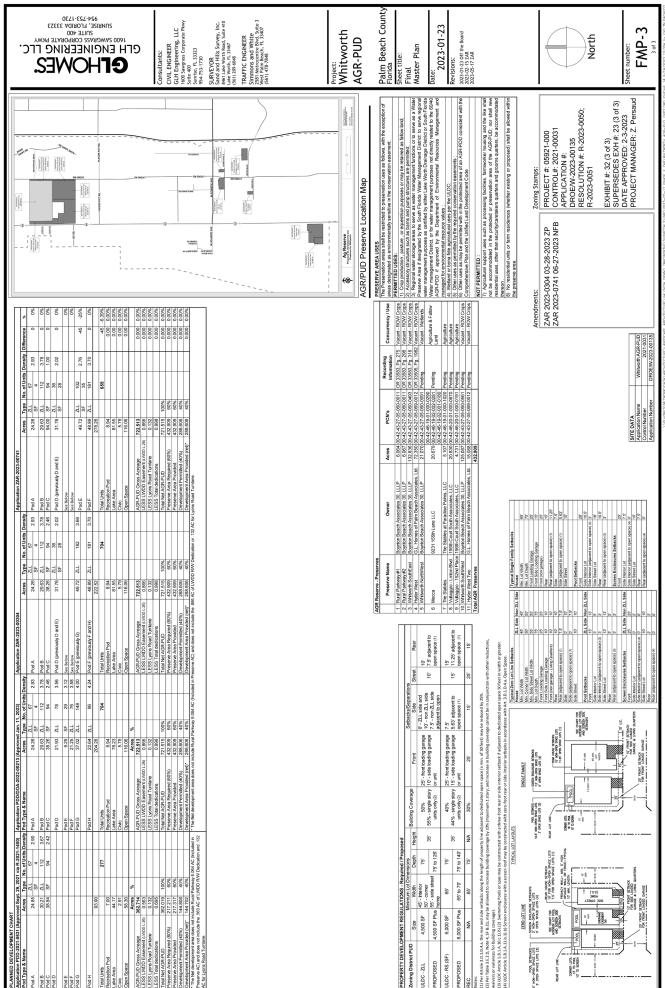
Approved Final Master Plan dated June 27, 2023 (Page 3 of 3)
